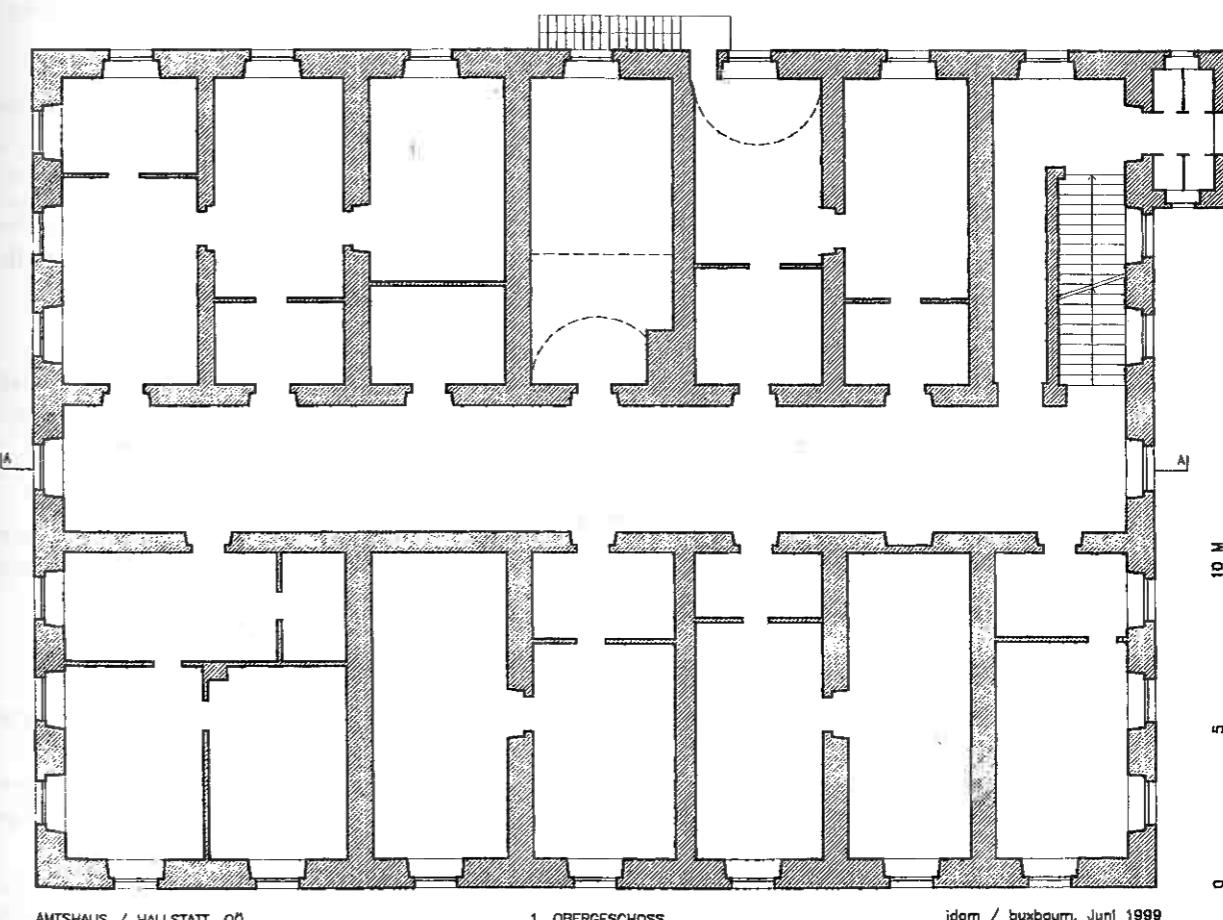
Amtshaus, First Floor (Idam/Buxbaum)
